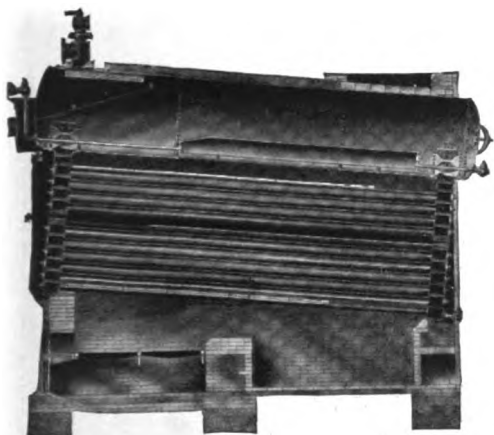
Longitudinal Section of Heine Two Pass Boiler, Type Installed in Equitable Building.
